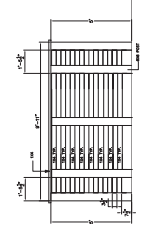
DETAIL OF WOODEN FENCE AND BRICK WALL ALONG
